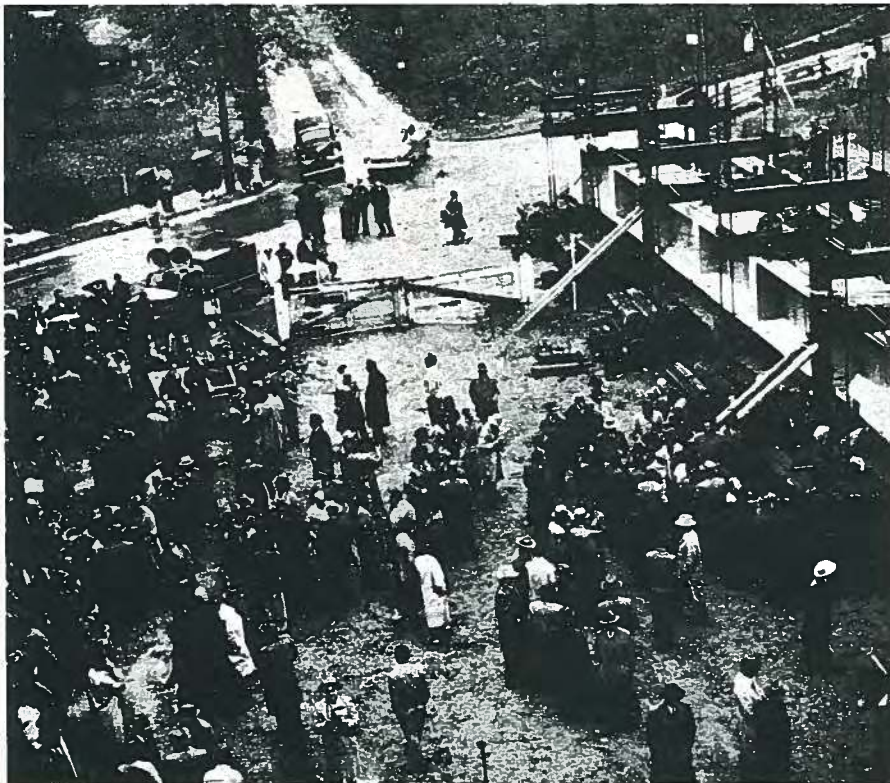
Over 300 engineers from 17 states and 5 countries witnessed the formal testing to destruction of an identical girder used in the main span of the bridge.
